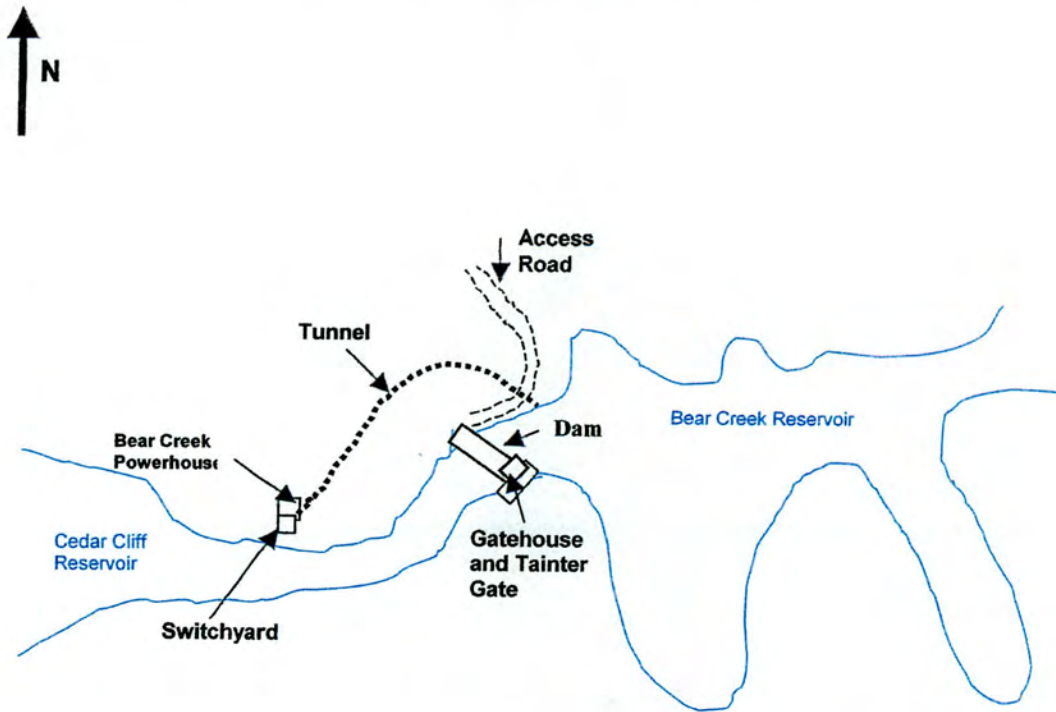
Bear Creek Dam and Powerhouse Site Plan.
